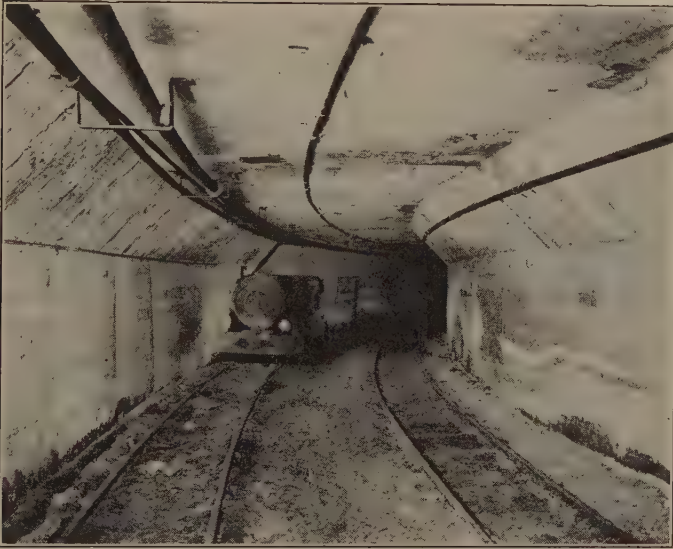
CONCRETED HAULAGEWAY, BATTERED (KNEE ARCH) DESIGN.
